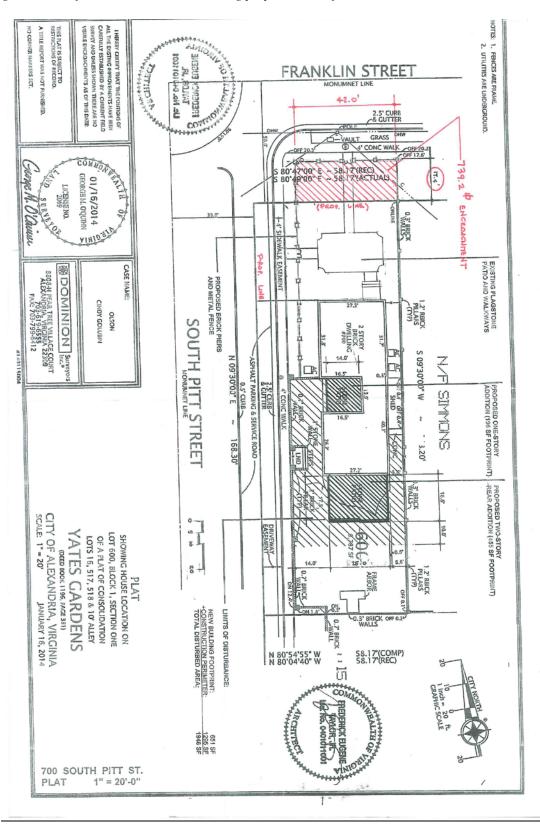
Plat of 700 South Pitt Street showing proposed area of encroachment.
